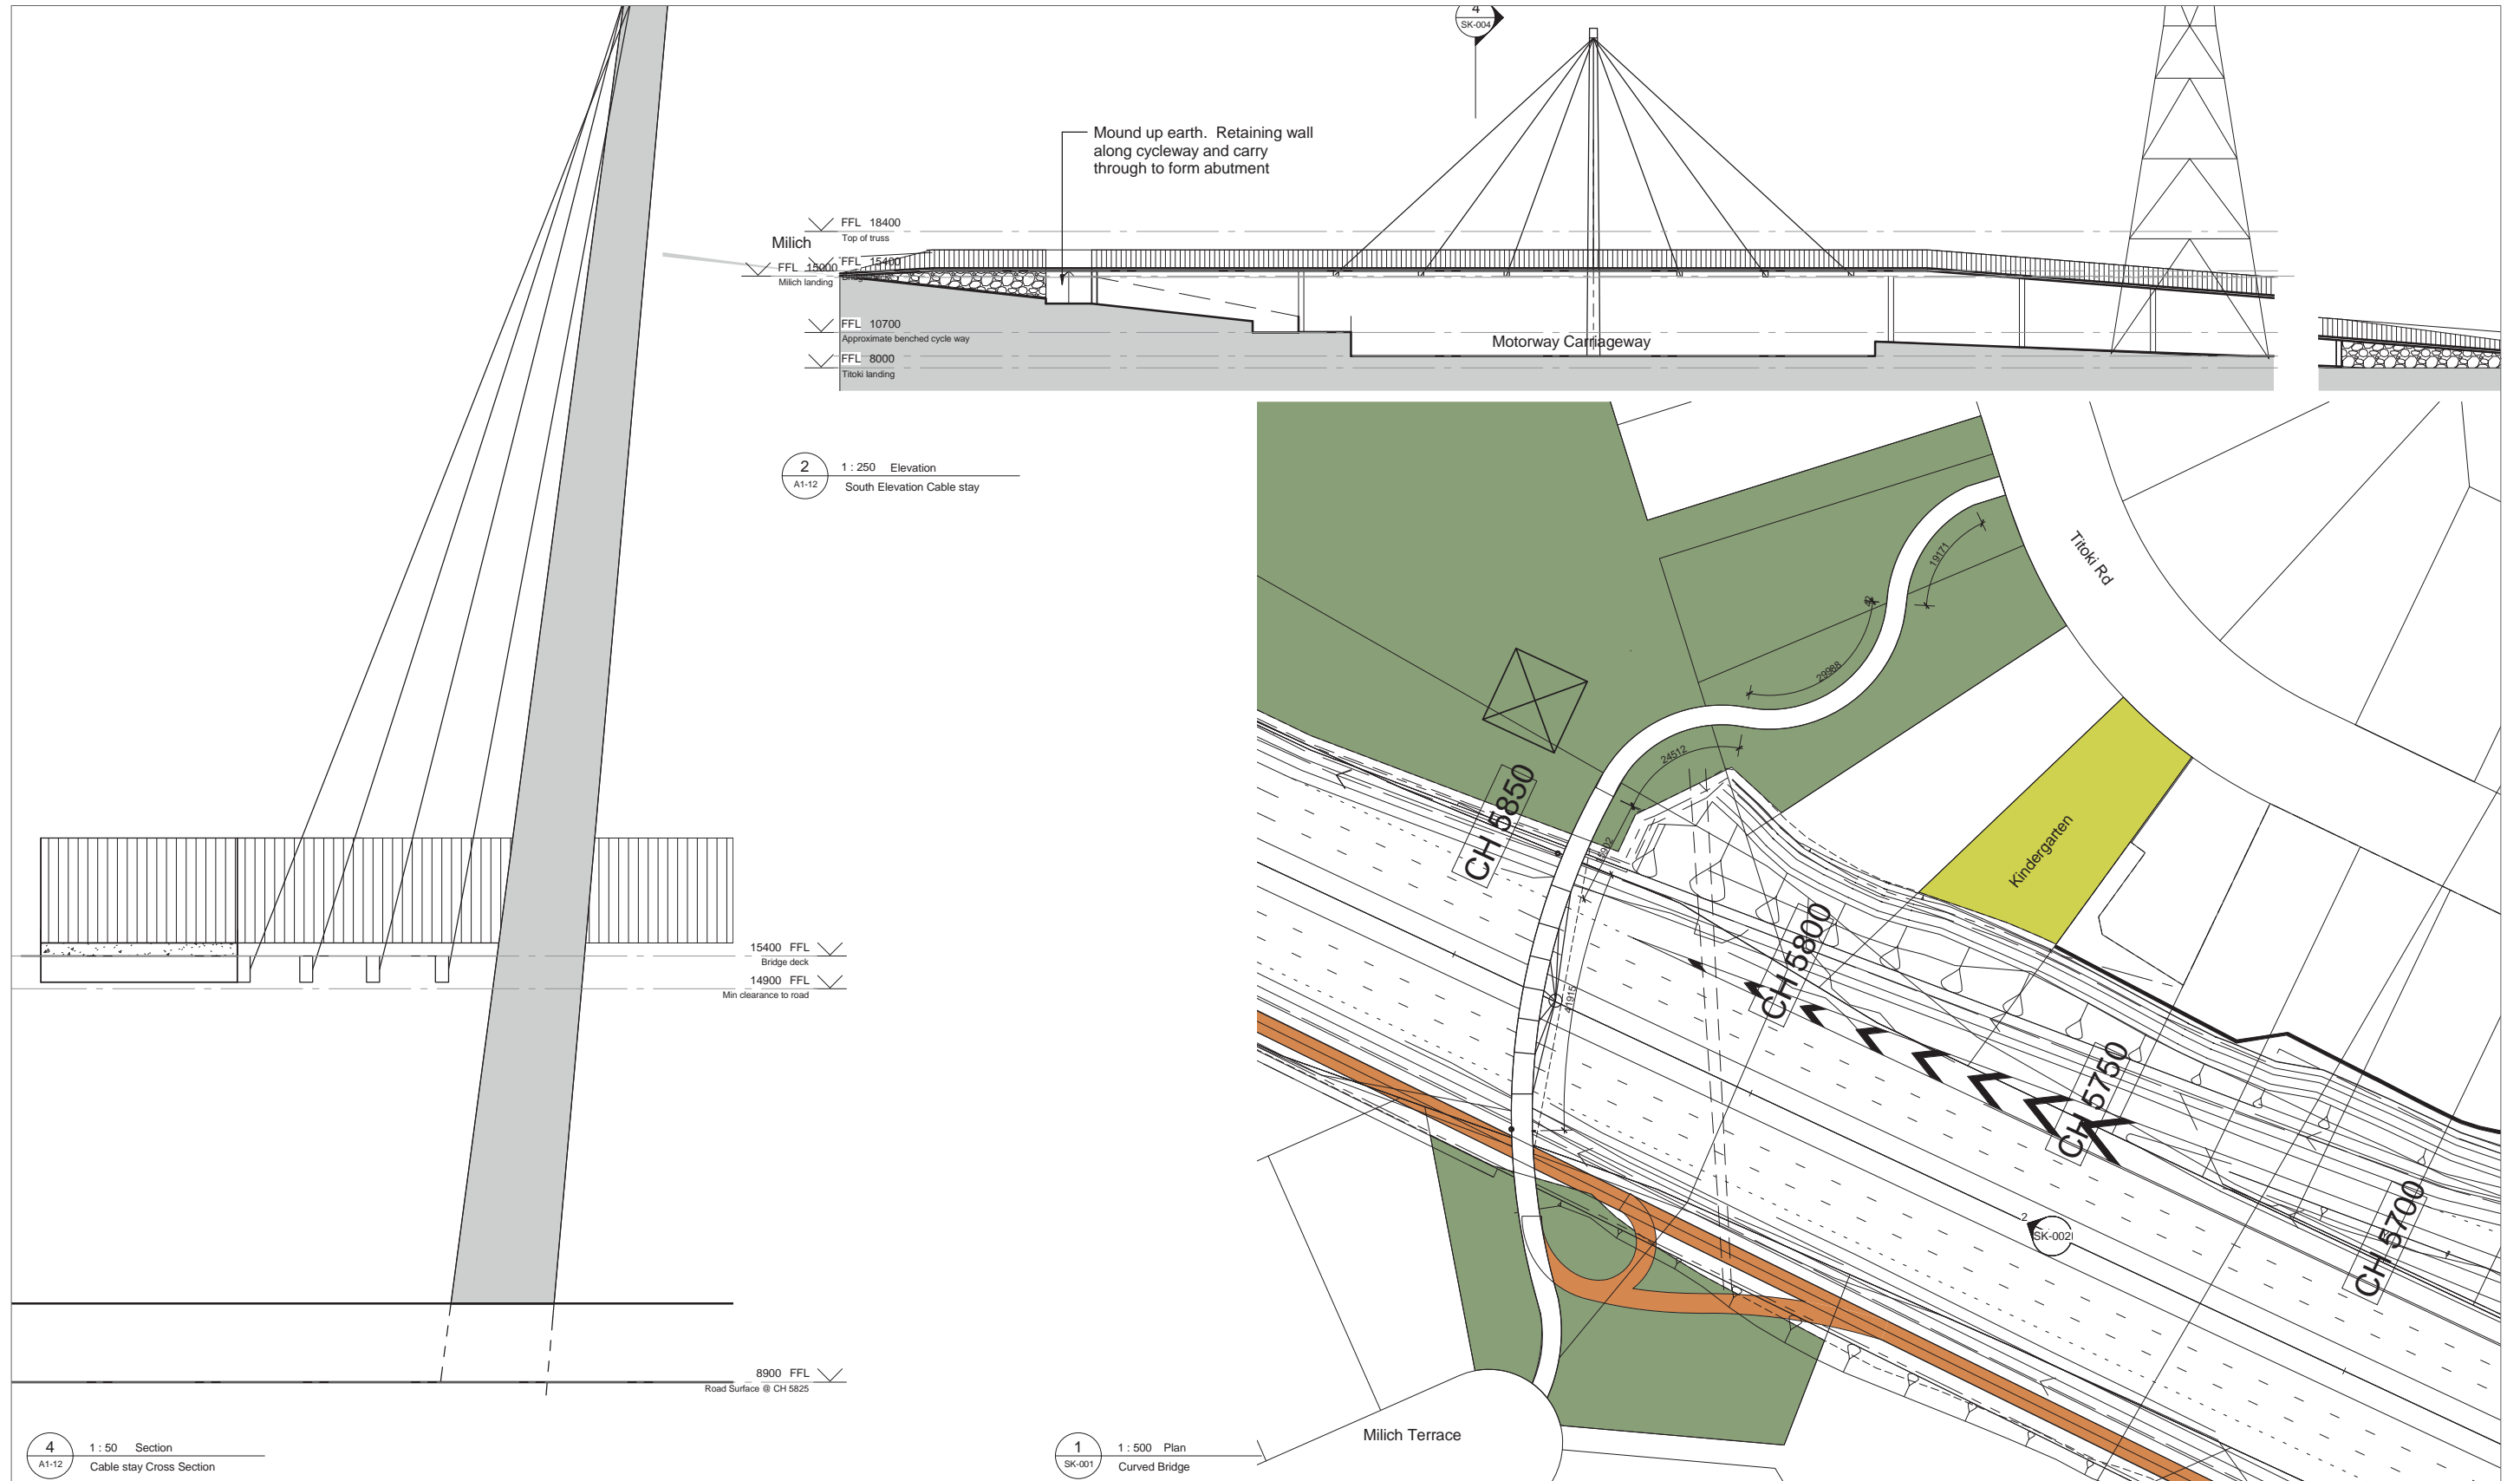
Potential future Milich Avenue - Jack Colvin Park footbridge – preferred concept option, Cable-stayed curved plan
